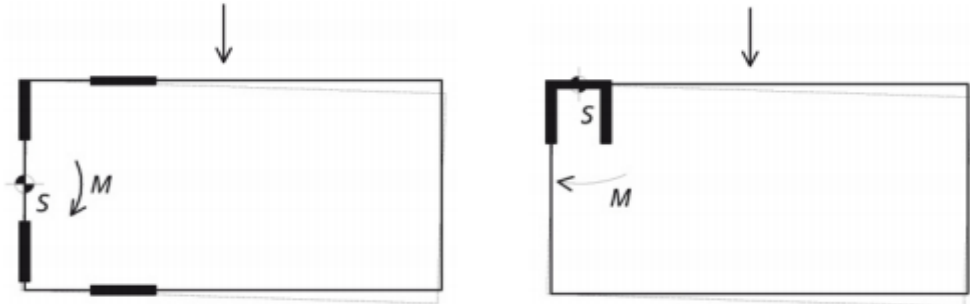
Unsuitable arrangement of shear wall (Wallner-Novak et al., 2014)
